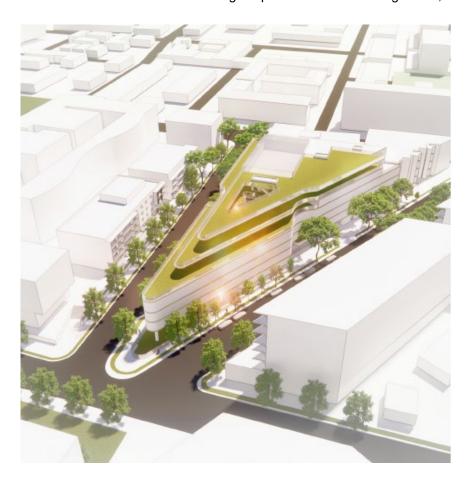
Indicative building envelope. Source Plus Architecture Landscape Plans
